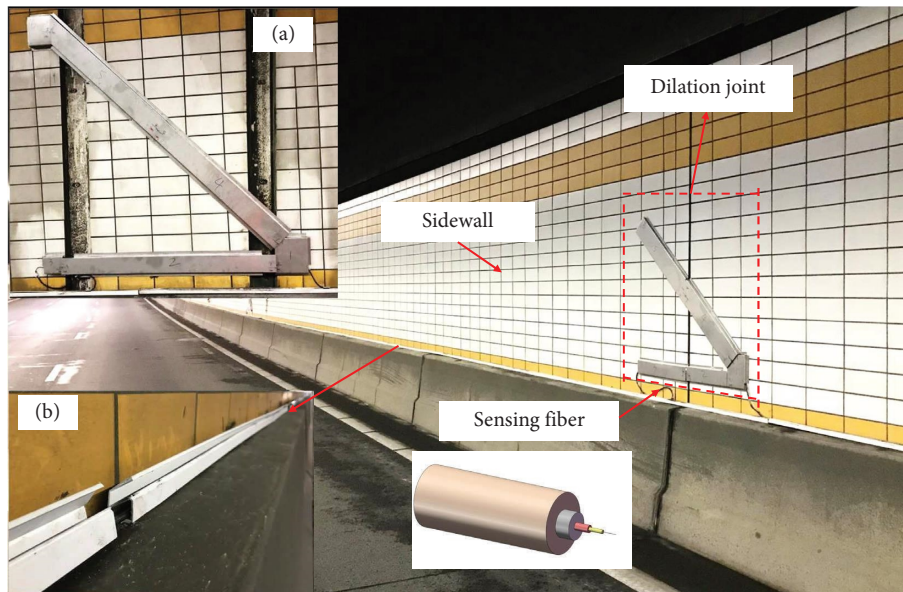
Completed DFOS monitoring network in the First Heineoordtunnel: (a) sensor block at immersion joints; (b) loose connection FO cable in protective PVC ducts.
